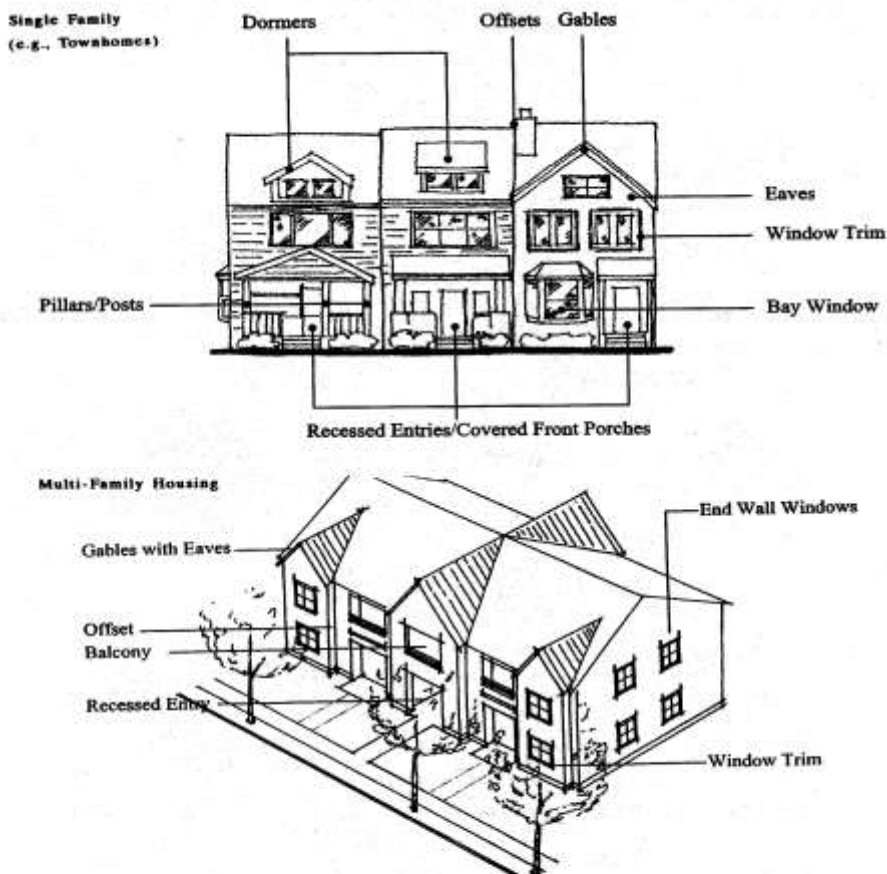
[Examples of Architectural Details (Duplex)]
